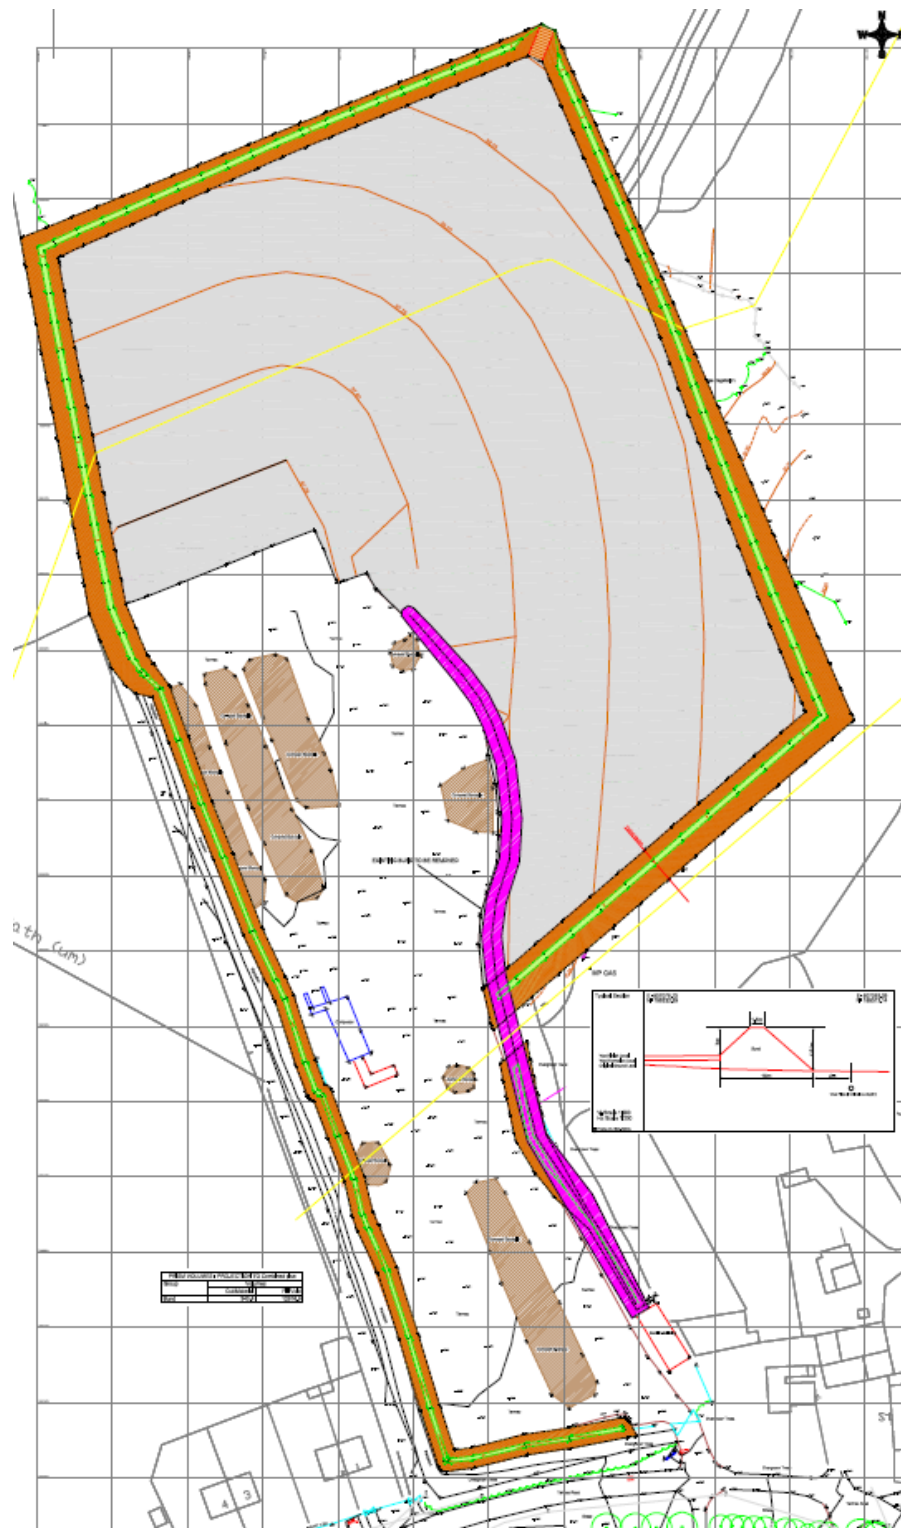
the expansion site showing the extra concrete area in grey. the movement of buildings from south site to north side is not shown on this topographical formation
